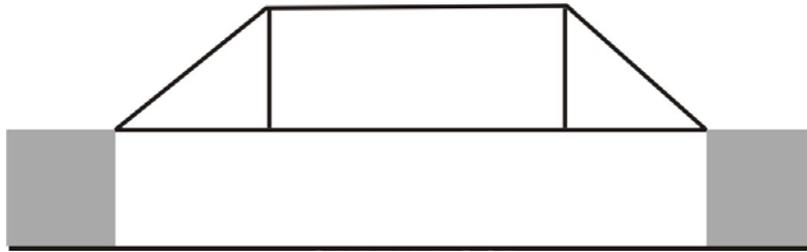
Hortense Bridge, spanning Chalk Creek on State Highway 162 (1880), Nathrop vicinity, Chaffee County, Colorado. This bridge is an example of a queen post truss built by Denver South Park & Pacific Railroad.
